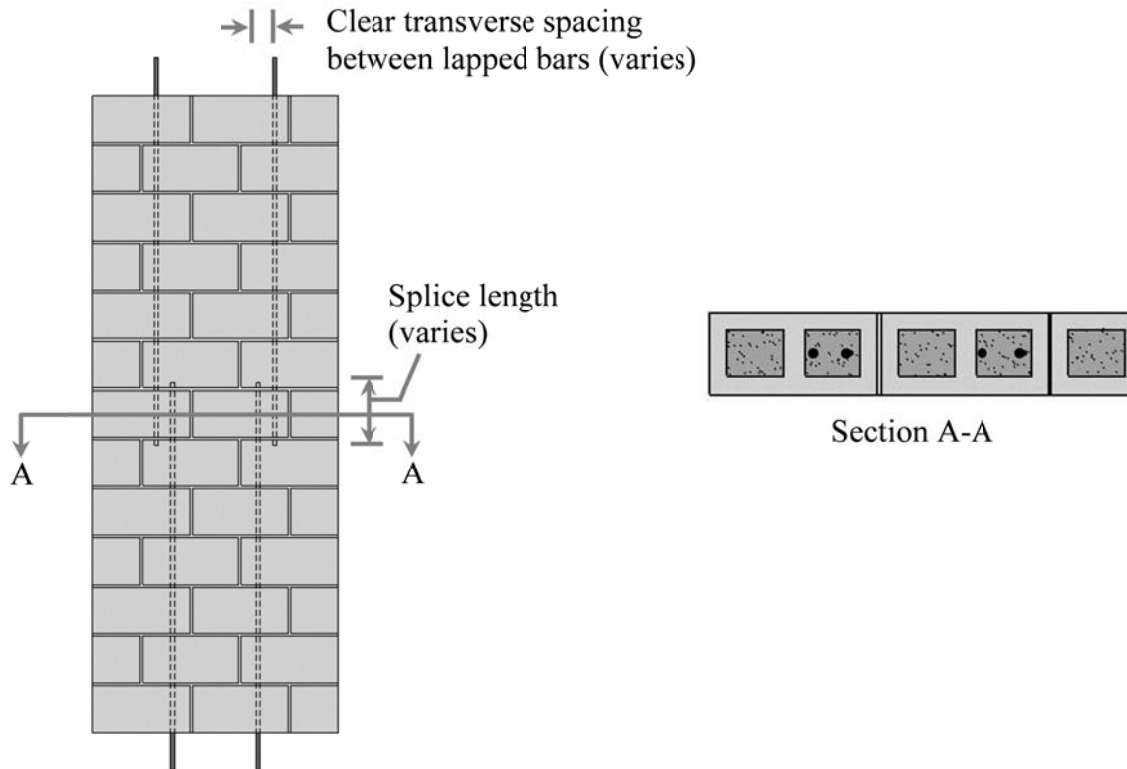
Wall Splice Specimen Geometry (Sanchez & Feldman, 2013).
